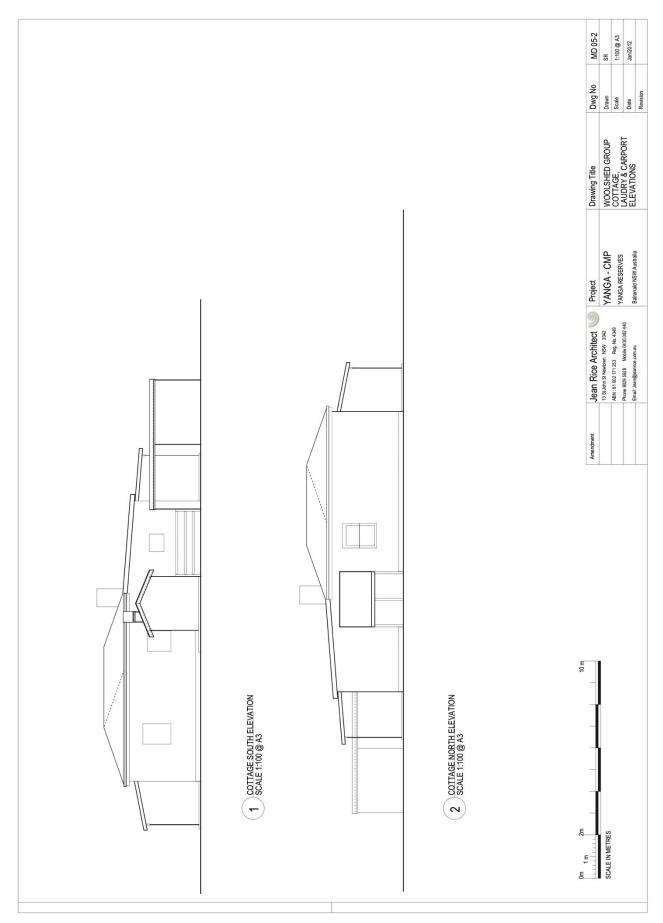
Woolshed Group Woolshed Cottage elevations. Jean Rice Architect, site assessment 2009.
